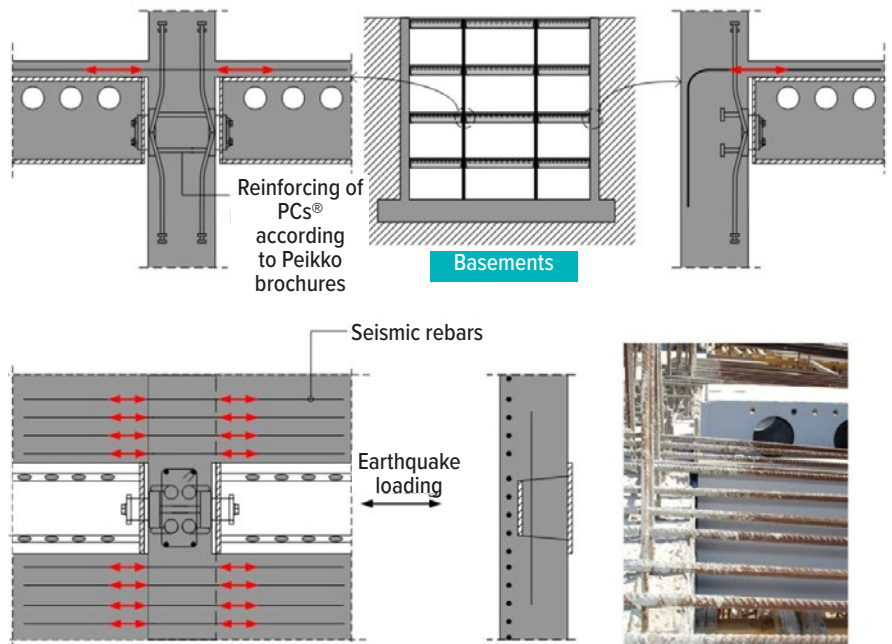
EXAMPLE OF TYING REINFORCEMENT IN BASEMENT STRUCTURES
